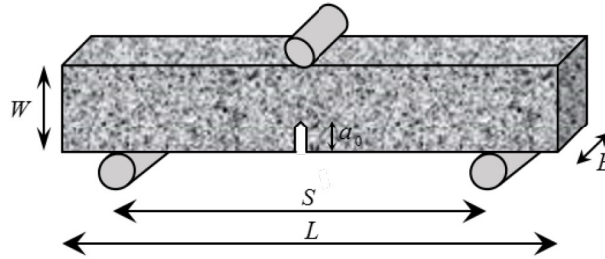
Geometrical sizes and loading configuration for three point bending test on notched specimens
